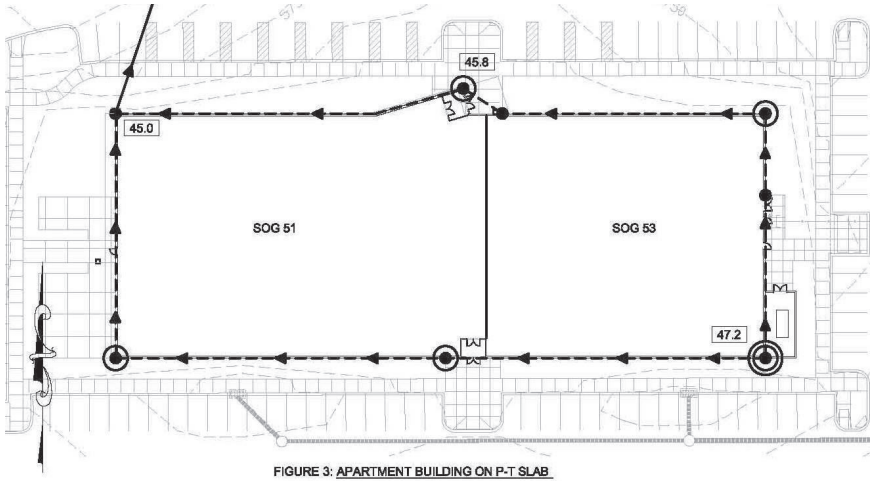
APARTMENT BUILDING ON P-T SLAB
